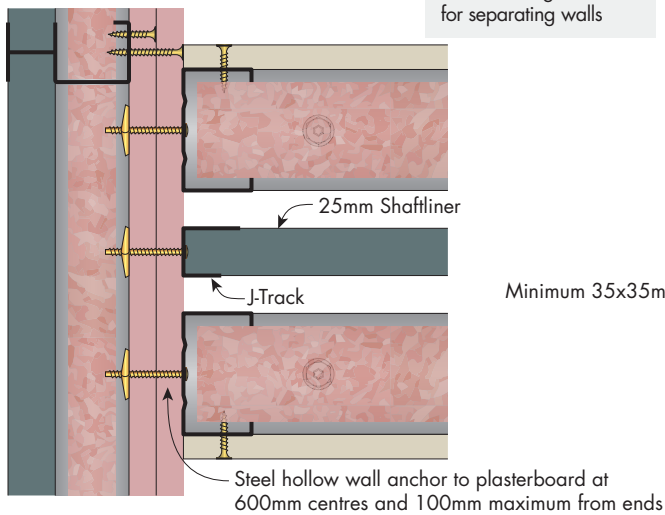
Highrise InterHome Wall Around Column Detail
